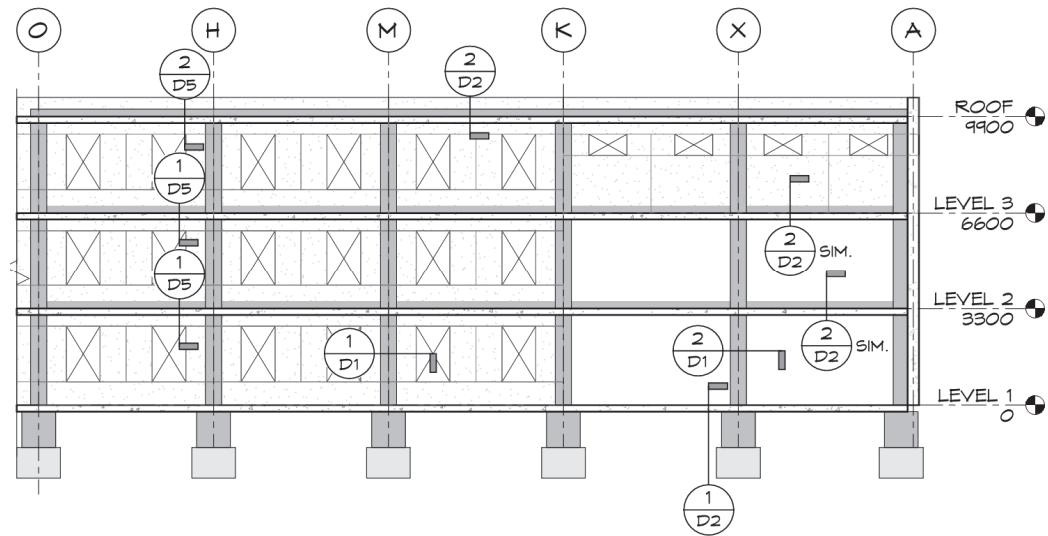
Elevation showing jacketed columns in PC Increment 2.
